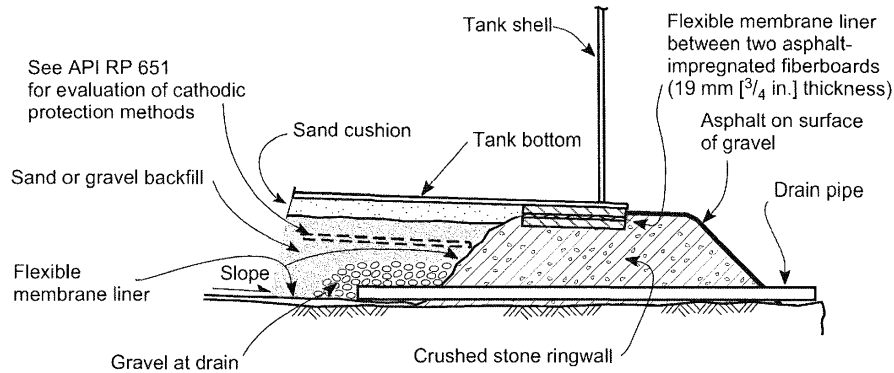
Crushed Stone Ringwall with Undertank Leak Detection at the Tank Perimeter (Typical Arrangement)
